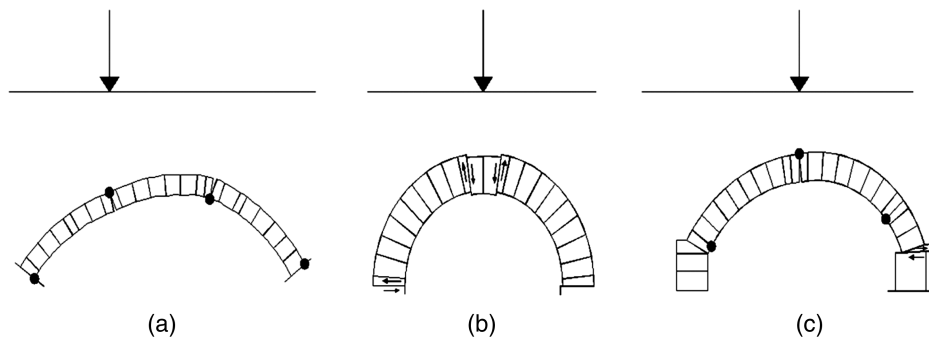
Collapse mechanisms of stone arch bridges (data from Gilbert 2007)
